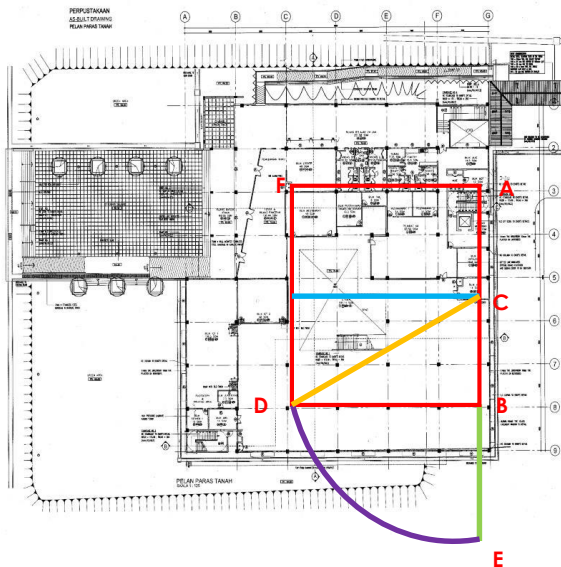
Golden rectangle (vertical side) on the ground floor plan
